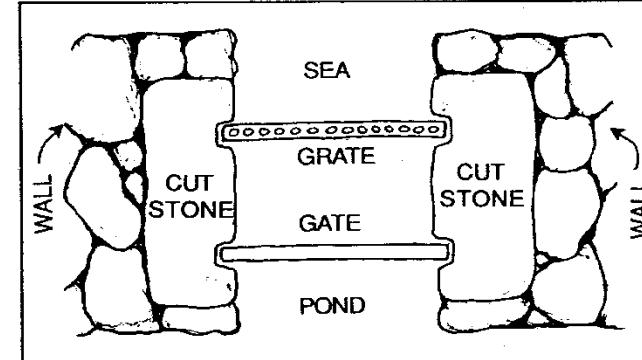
Drawing of typical mākāhā area in fishpond wall. (Modified from Kelly, 1975)
